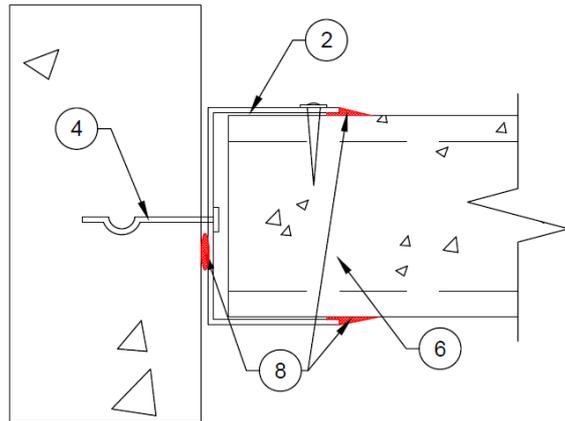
Cut-off Panel End Detail for Vertical Speedpanel Wall
